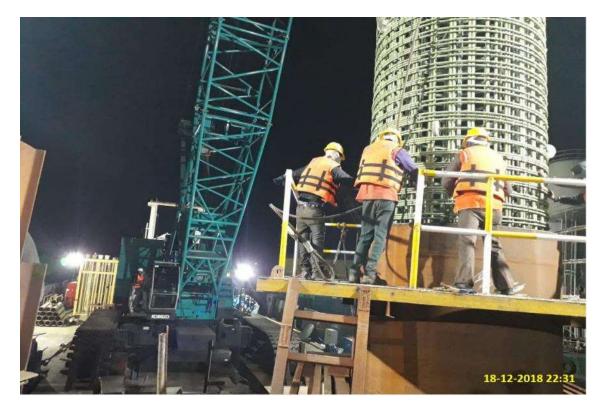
Reinforcement cage installation at MP 95 in Marine Portion in progress
